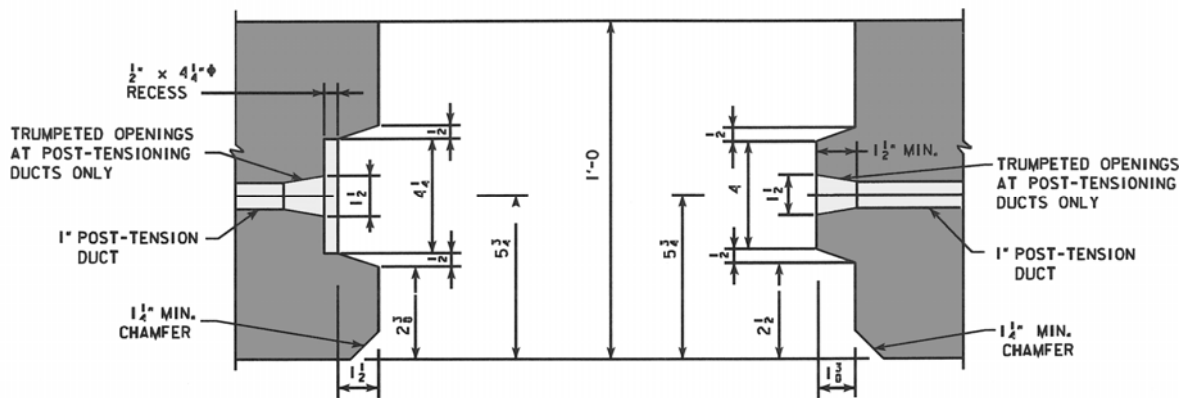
Illustration. Transverse keyway dimensions for the precast panels (dimensions in inches). (Note: 1 in. = 25.4 mm)
